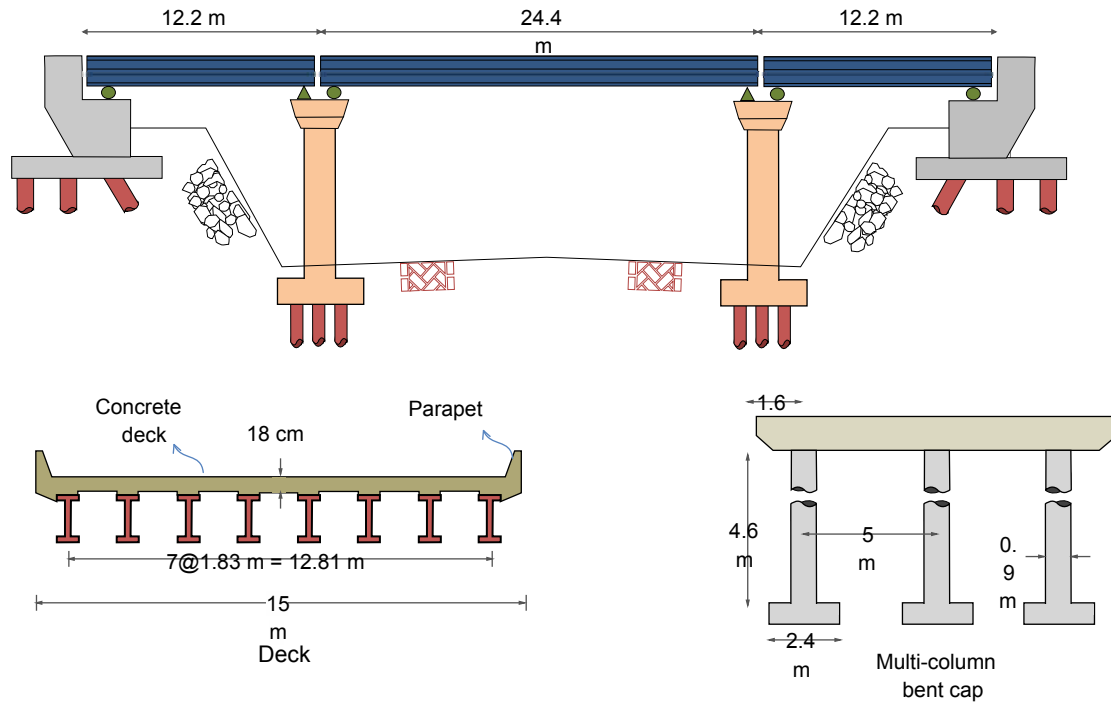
MSSS Concrete Girder Bridge Configuration
